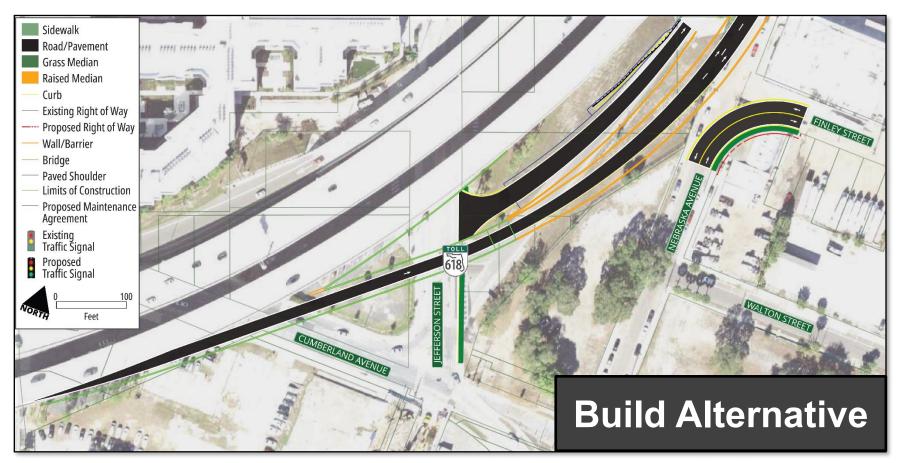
Alternative 1 – Whiting Street Off-ramp (Exit Ramp 6B)
